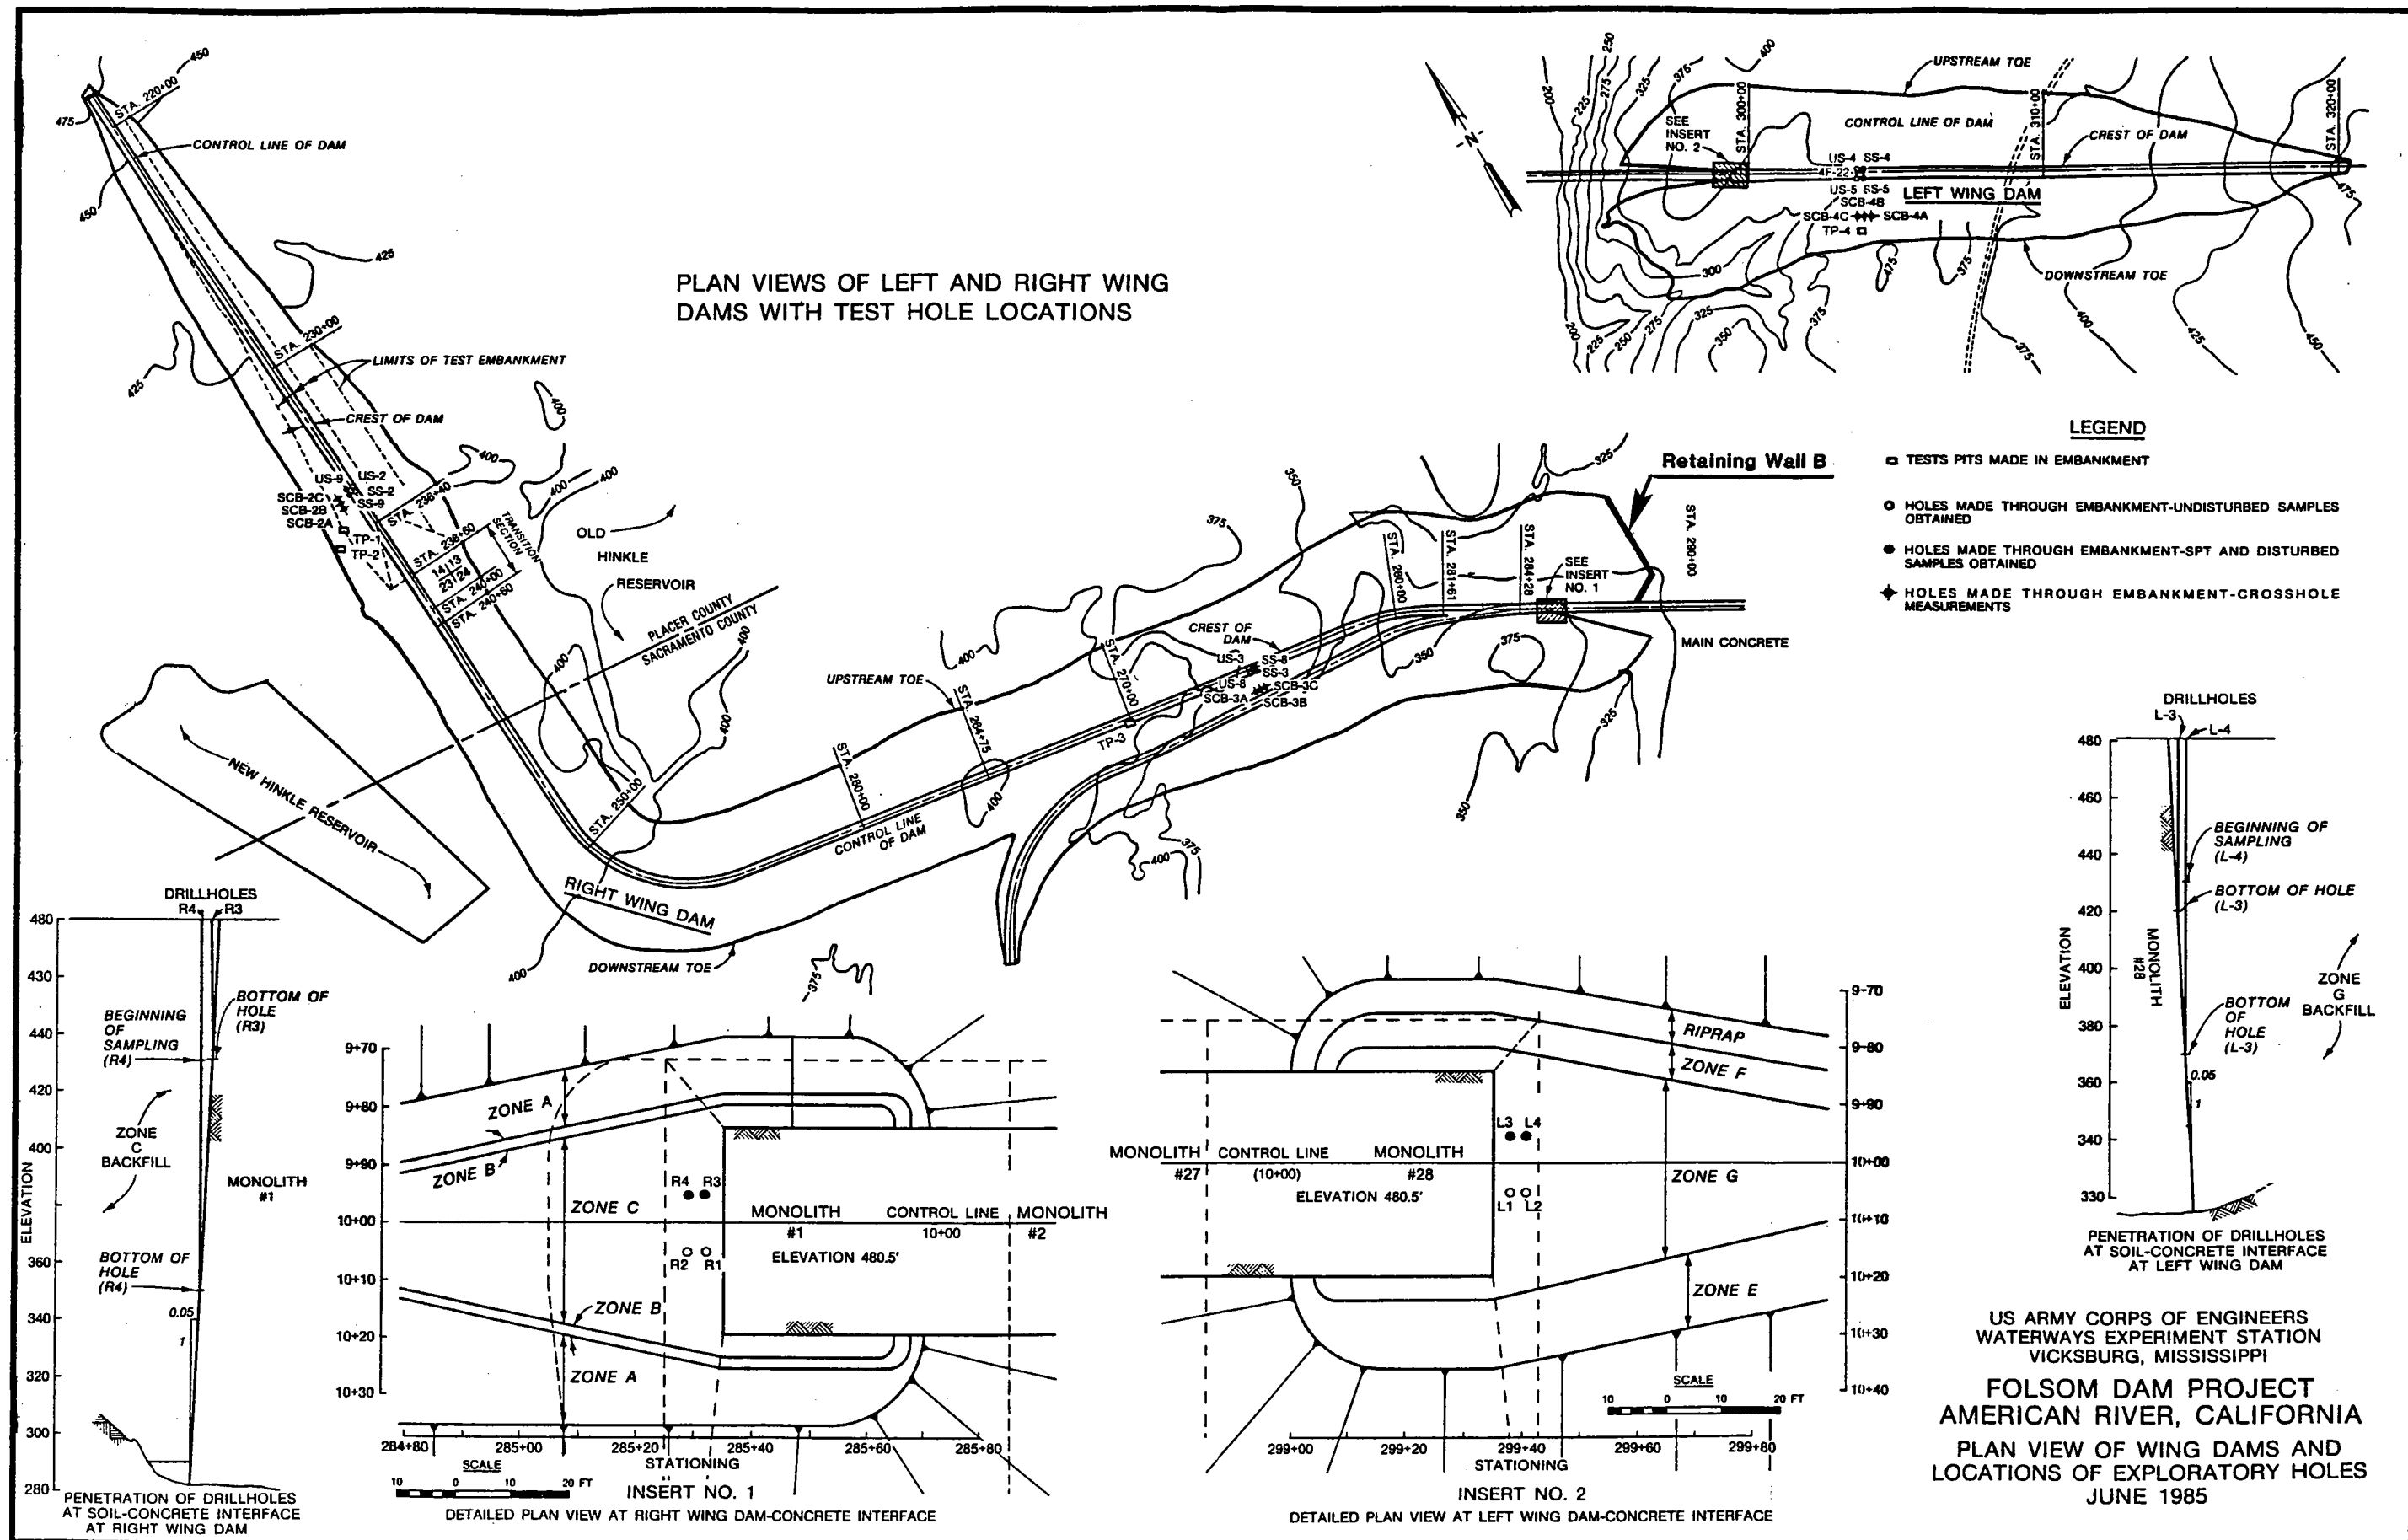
Plan view of Right and Left Wing Dams and detailed plan view of Interface areas.
